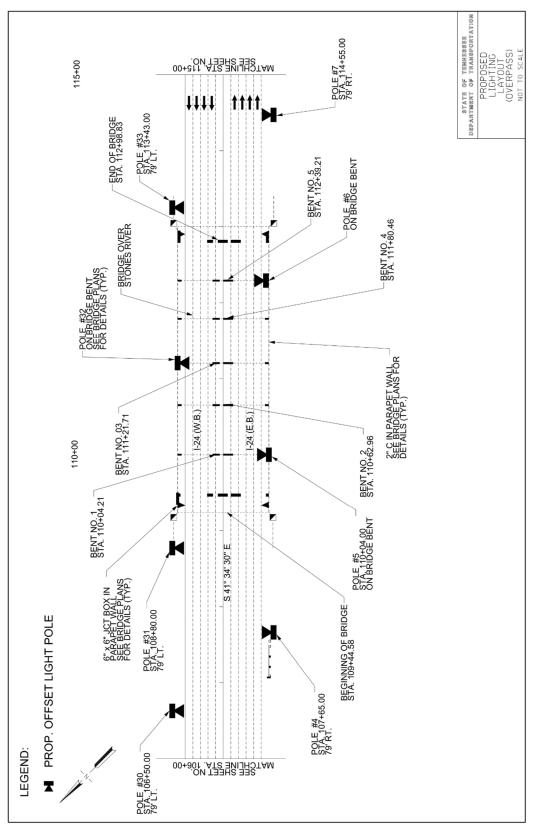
Detail of Proposed Lighting Layout at Bridge Overpass (NTS)
